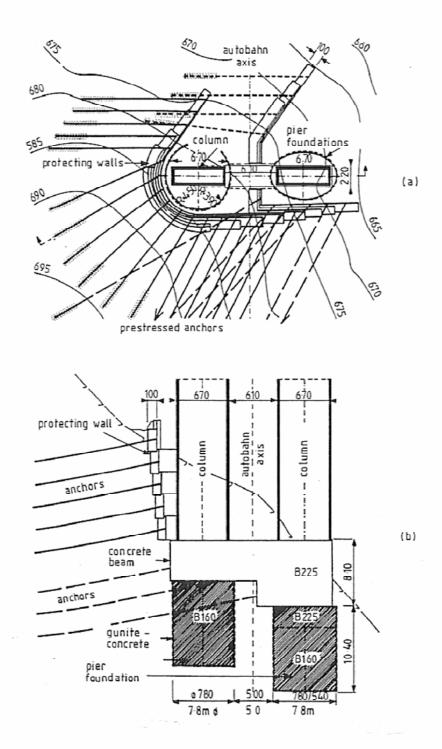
Bridge pier foundation protection against soil creep by an anchored wall (a) plan, (b) elevation (from Hanna, 1982)
